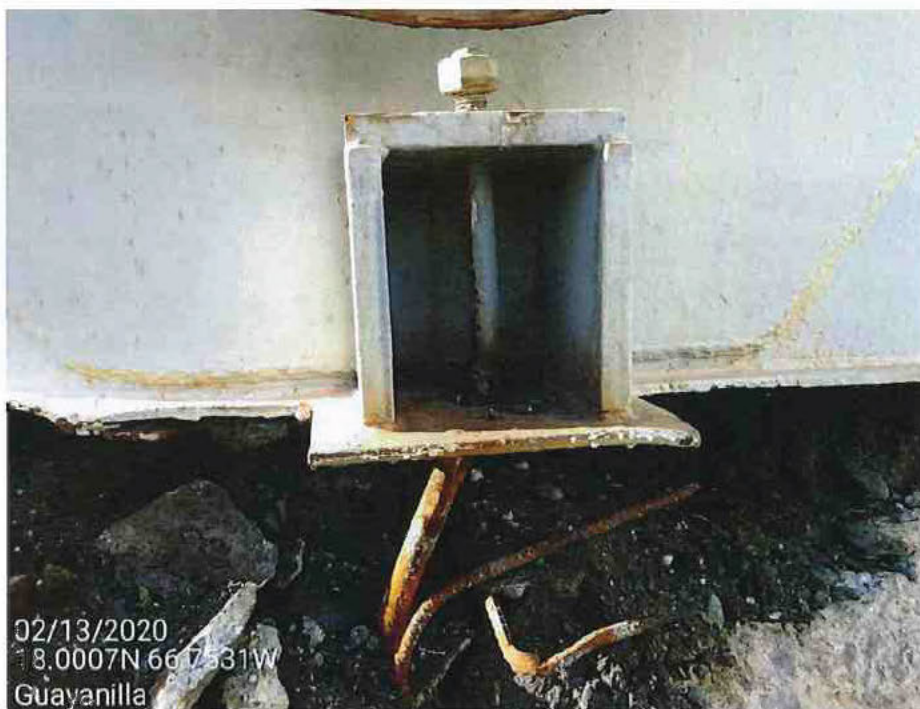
Anchor bolt ripped off from concrete base, due to seismic overturning moment.
